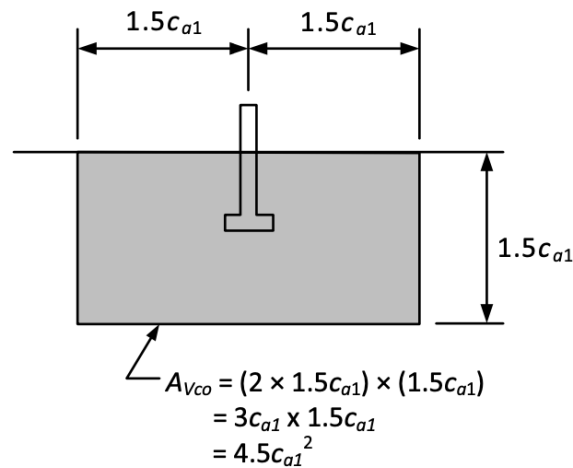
Shear breakout cone area in elevation view (CSA, 2019)
